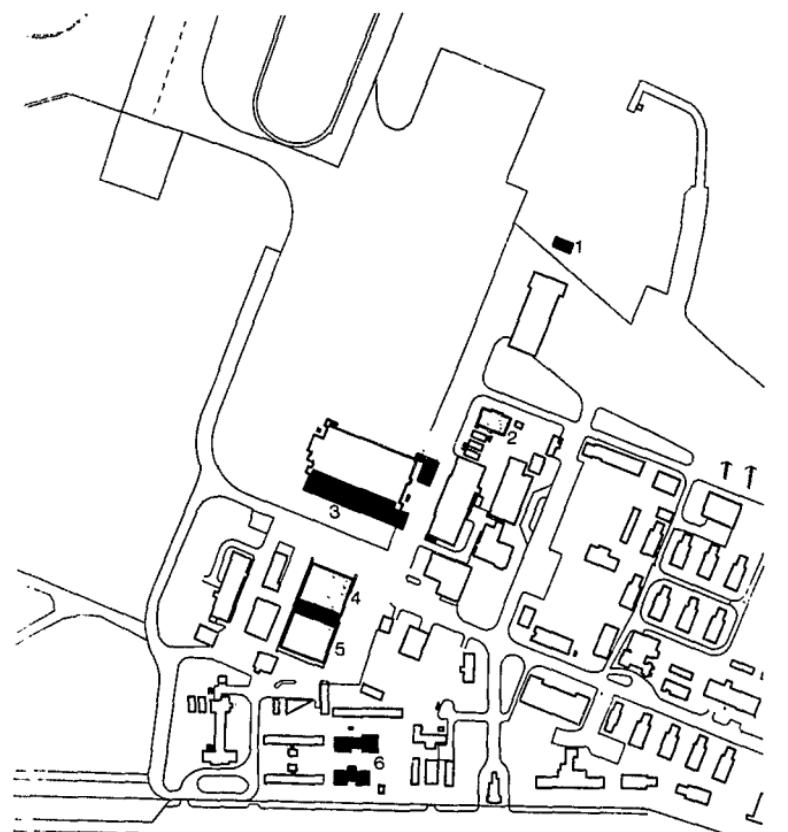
TOWNSVILLE RAAF BASE ZONE PLAN
